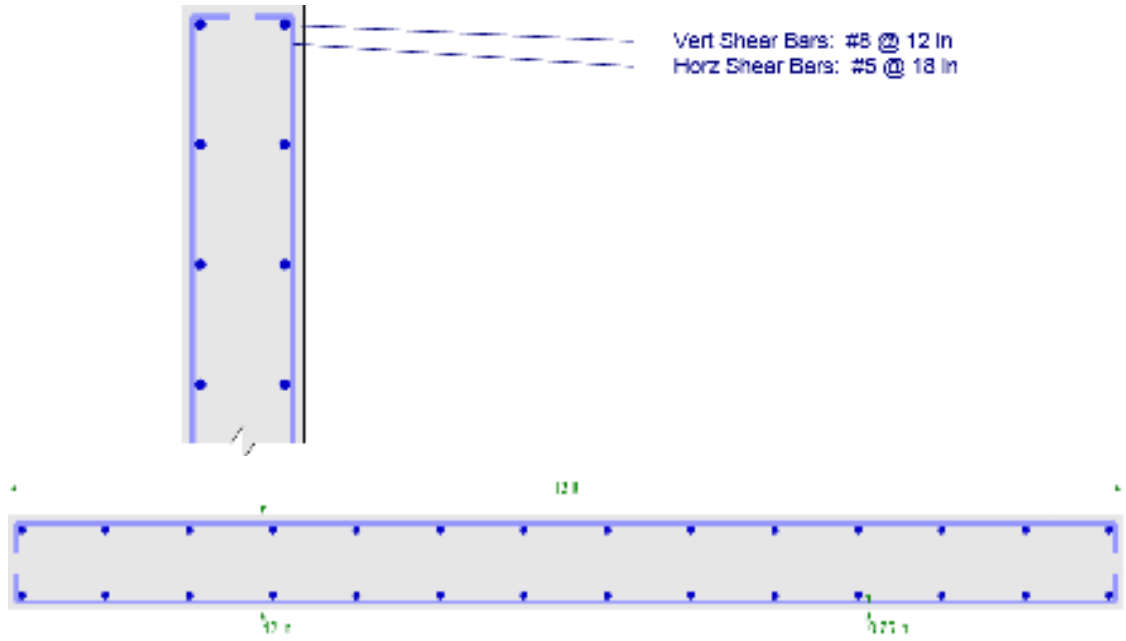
Building (B6-9S-M-S) Special RC Shear Reinforcement Details; Wall Section for Floors 4-6
